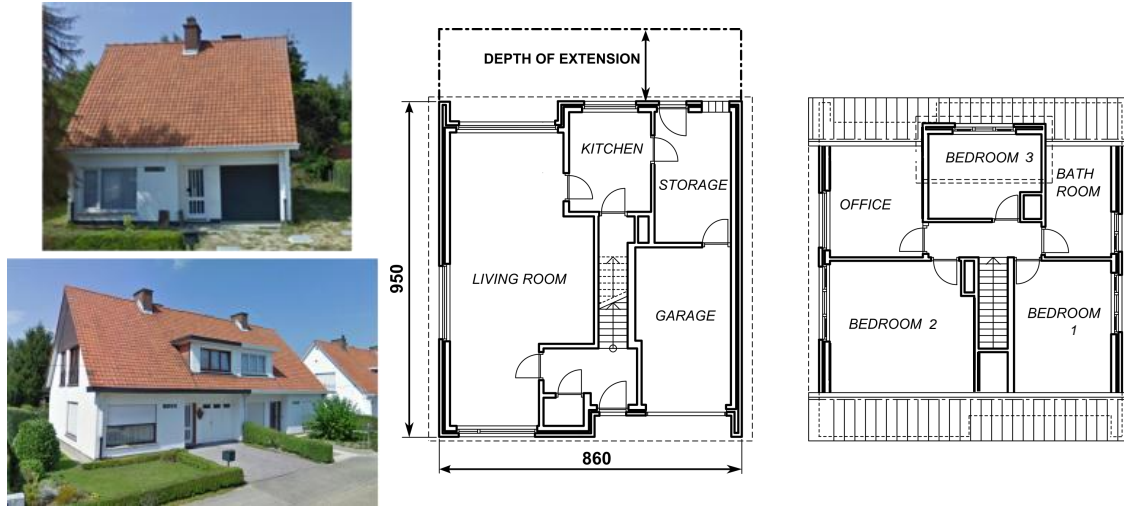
Casestudy dwellings: pictures (open and semi-terraced) and floor plans of ground and first floor of the open typology (dimensions in mm).
